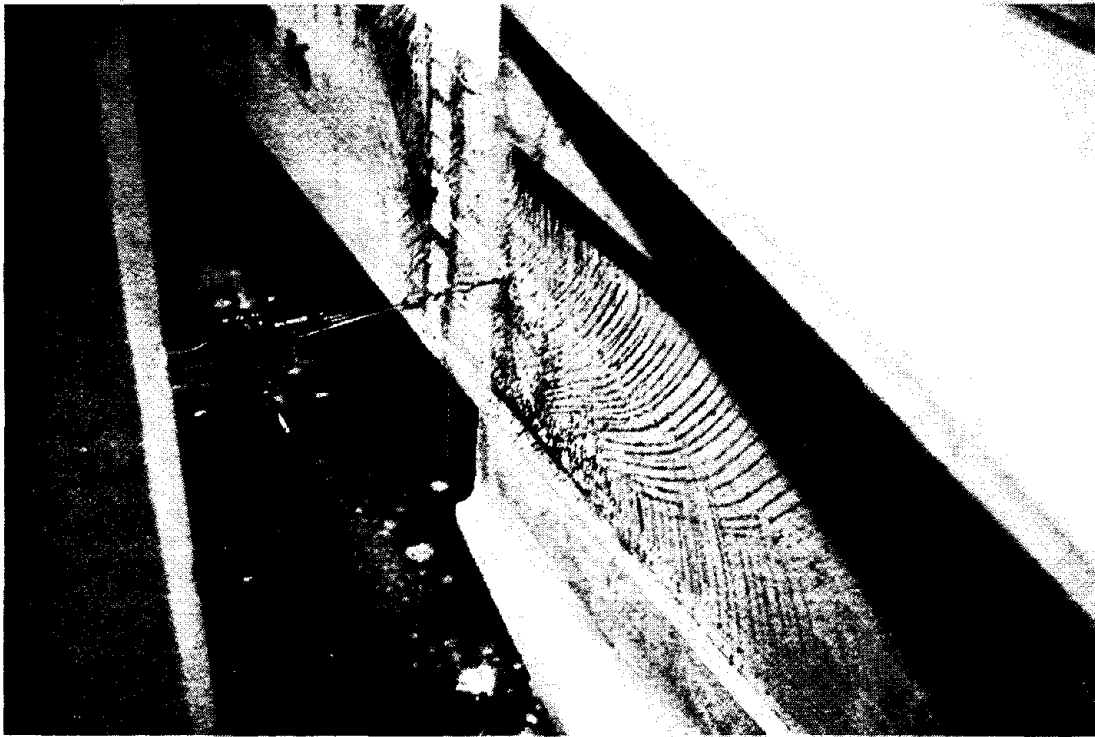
Yield Pattern of Bottom Beam Flange and Separation Between Beam Flange and Tee at 2-in. Displacement, Cycle 2 (caused by 3-in. long weld tear)
